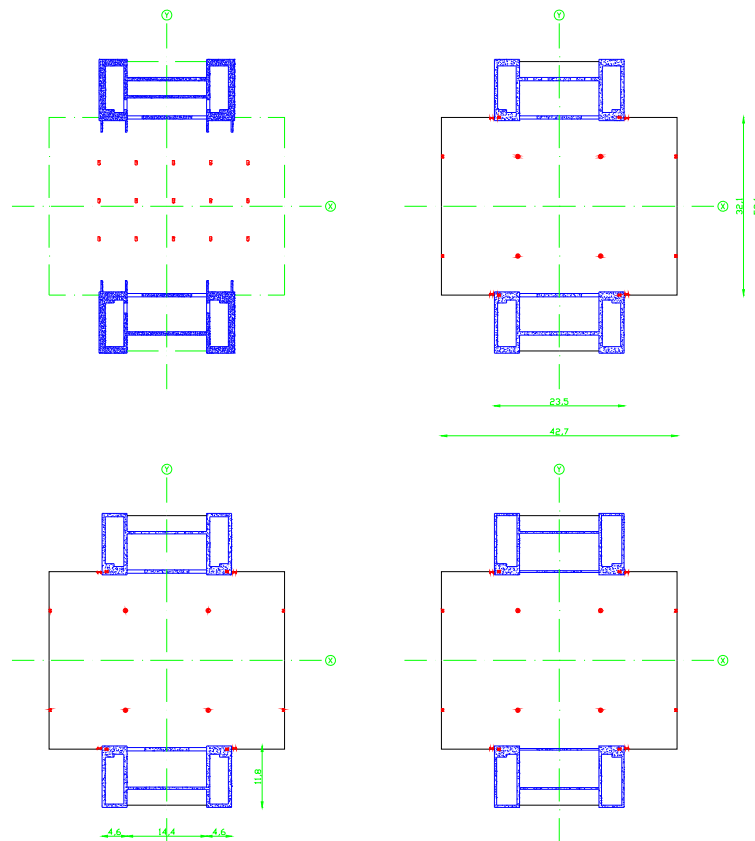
Typical floor plan at basement, low-, mid- and high-rise section
